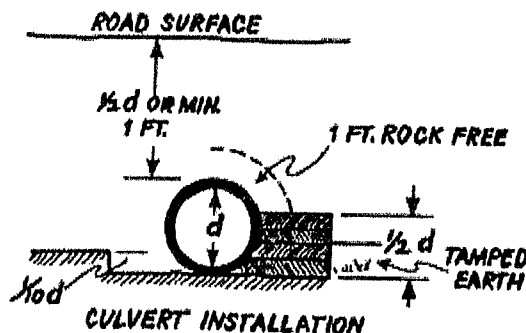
The elements of a properly installed ditch relief culvert. The culvert is angled at about 30 degrees to the road alignment to help capture flow and prevent culvert plugging or erosion of the inlet area. It is set at the base of the fill (ideally) or with a grade slightly steeper than the grade of the contributing ditch (but never with a grade less than 2 percent) (USDA-SCS, 1983). At a minimum, the grade of the ditch relief culvert should be sufficient to prevent sediment accumulation at the inlet or deposition within the culvert itself (it should be self-cleaning) (USDA-SCS, 1983).
